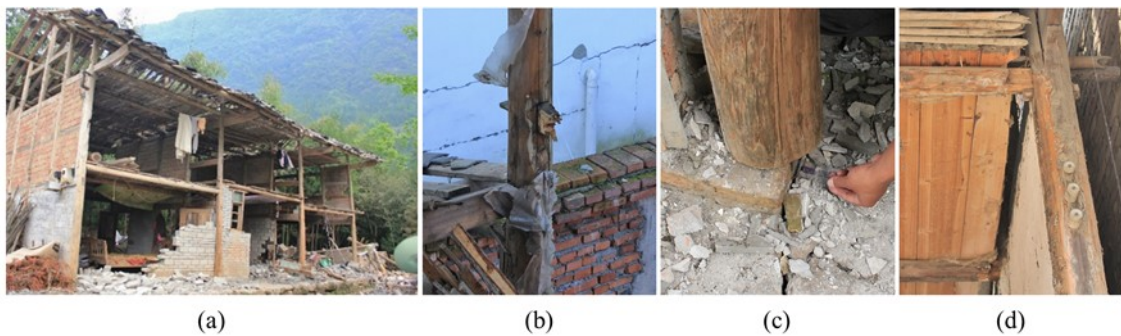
Damage to masonry-infilled Chuandou timber frame after 2013 Lushan earthquake in China[1-18]: (a) Collapse of the masonry infills; (b) sliding at column base; (c) fracture of beam tenon and (d) pull-out of beam tenon.
